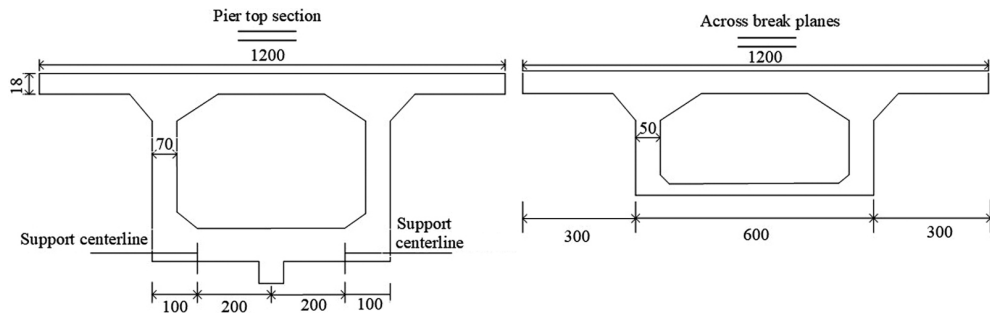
Cross-sectional view of the bridge (unit: cm)
